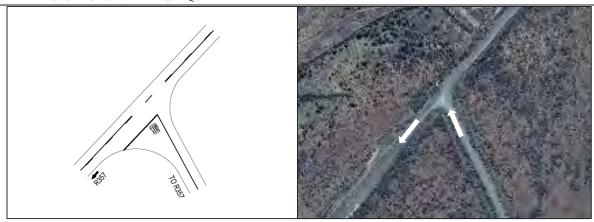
Geometric layout and aerial view of the R357 intersection
